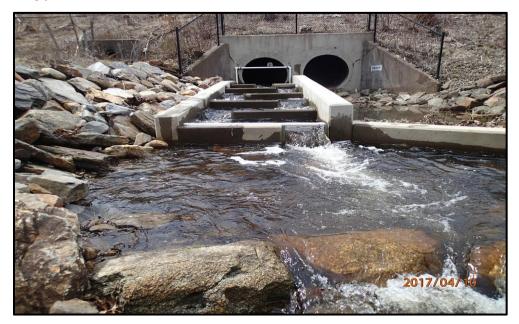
Upstream view of concrete pool and weir fishway, diversion wall and boulder weir holding pool.
